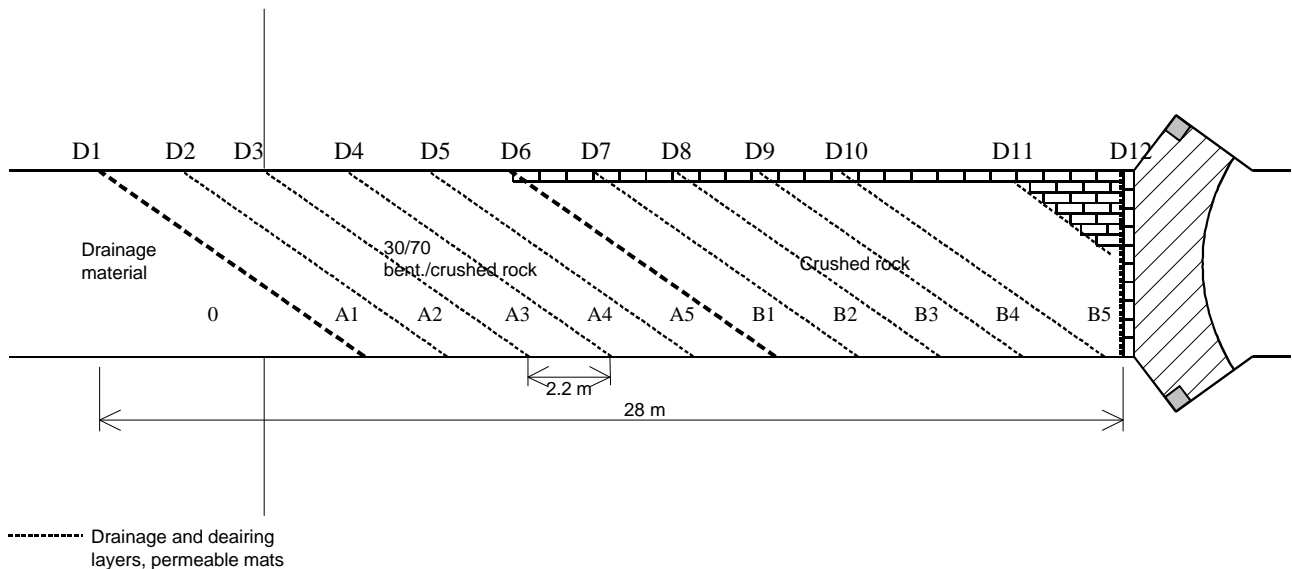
Numbering of backfill sections and drainage layers (permeable mats).
